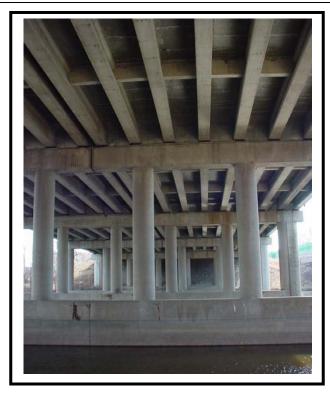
4-47: Prestressed Beams and Concrete Diaphragms
